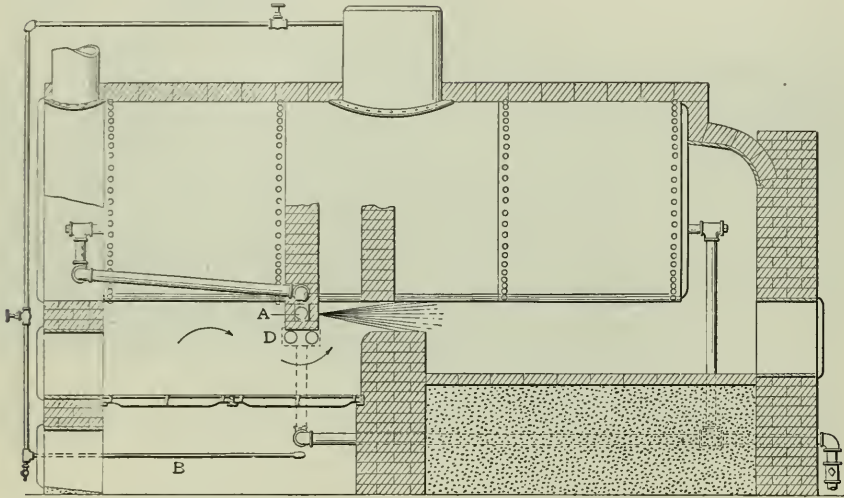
ORVIS FURNACE ADAPTED TO RETURN-TUBULAR BOILER
